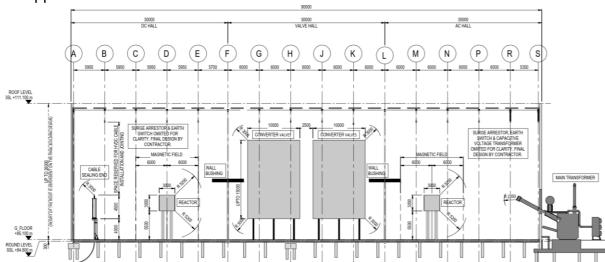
Converter building design Section view 1, extracted from indicative drawing EN020022-X.X-CHLP-Sheet1 in Appendix 1 (not to scale)
